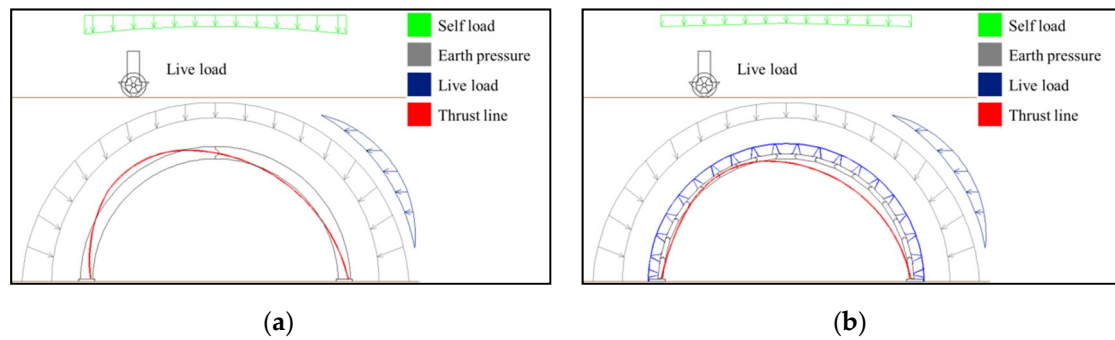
Thrust line of arch bridge with self-weight, earth pressure and additional load (after construction): (a) precast, three-hinged concrete arch and (b) a precast outrigger panel arch.
